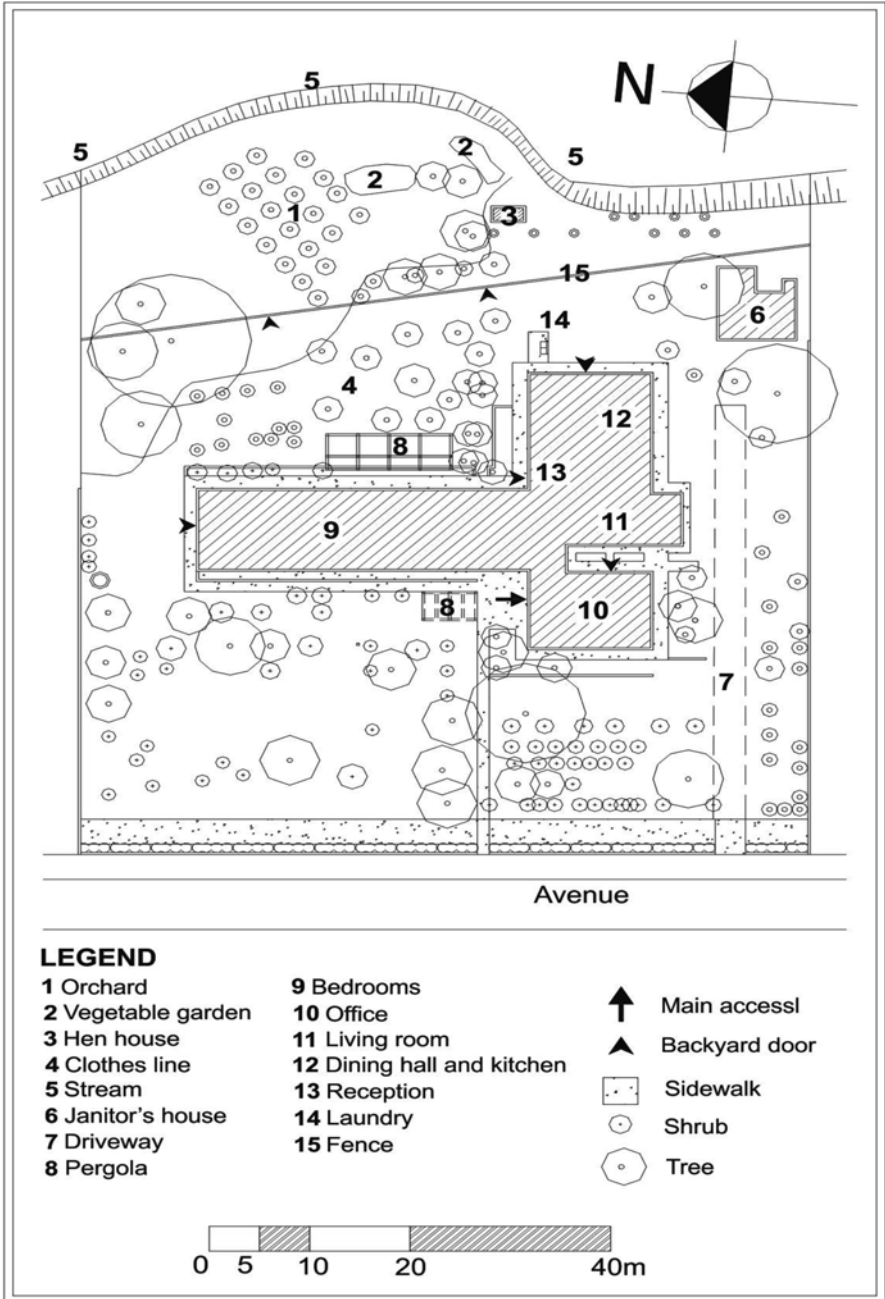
Ground floor (outdoor areas) (Source: Author)
